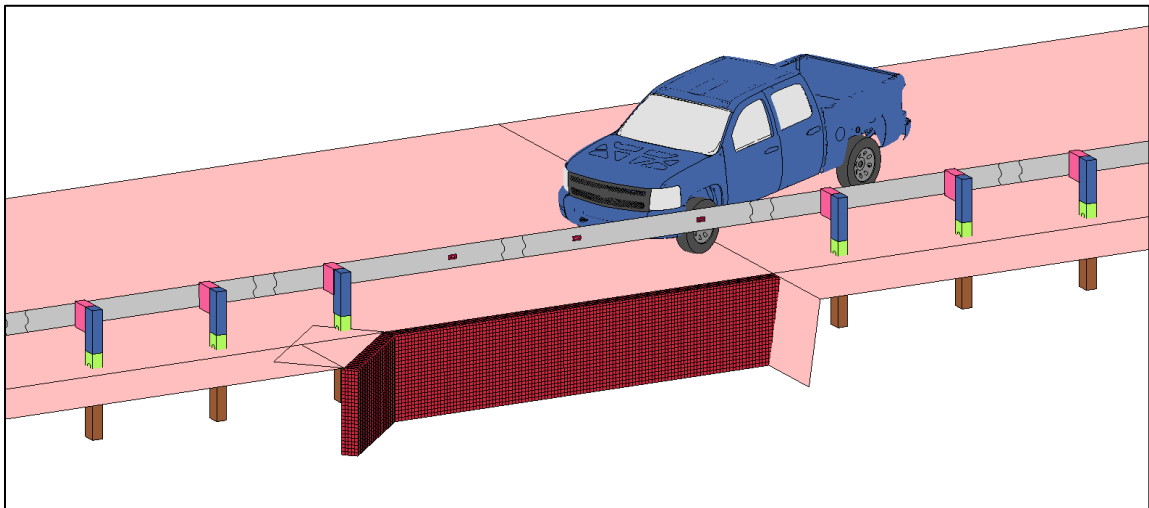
Single Wingwall Culvert, Test No. LSC-1
